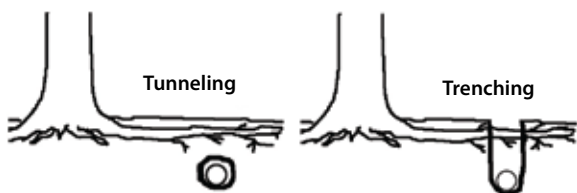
Utility lines may be placed near trees without root injury by tunneling underground. An alternative is trenching with a pneumatic air excavator or careful hand digging.
